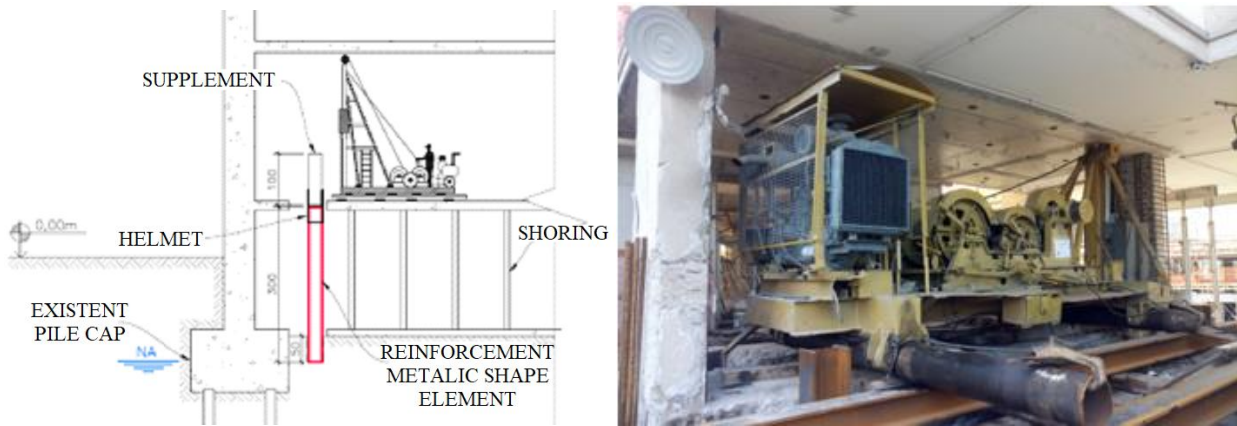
Detail of the adapted pile spiking positioned between slabs to perform the spiking services of the structural reinforcement piles.
